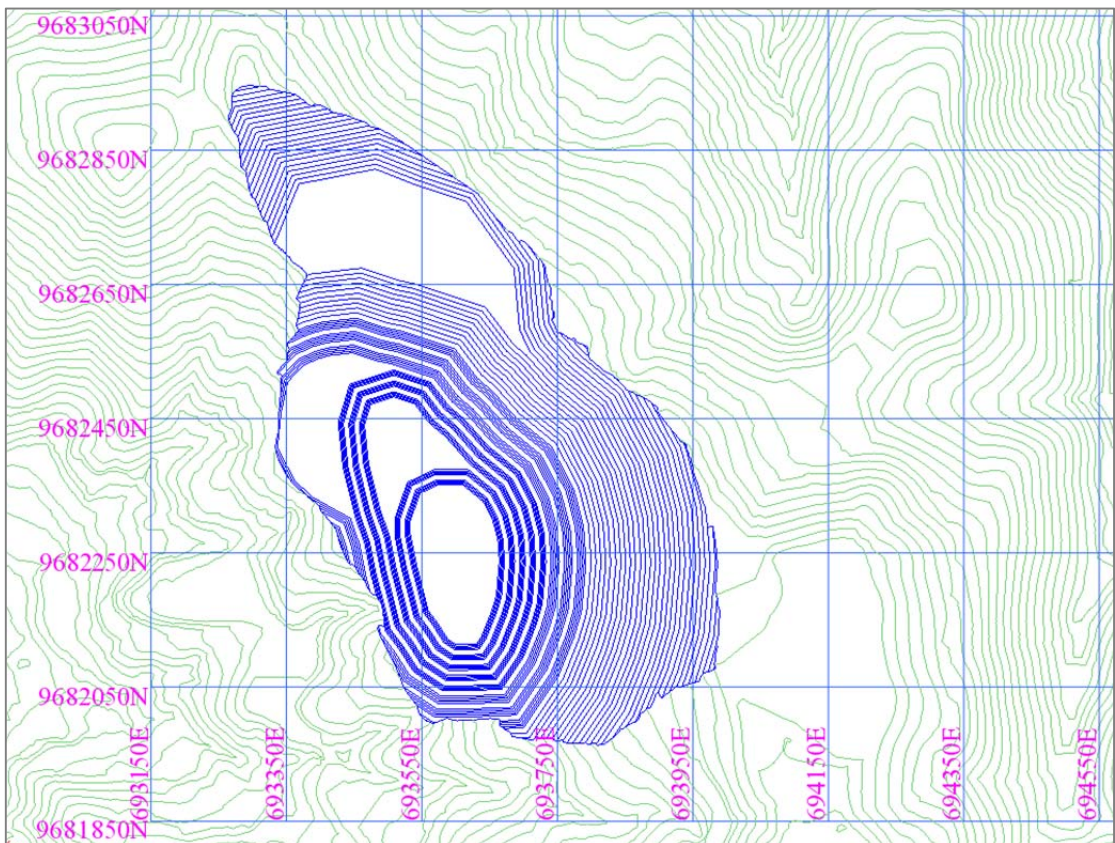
Twangiza Main Intermediate Pit (Cut 2) – Plan View
